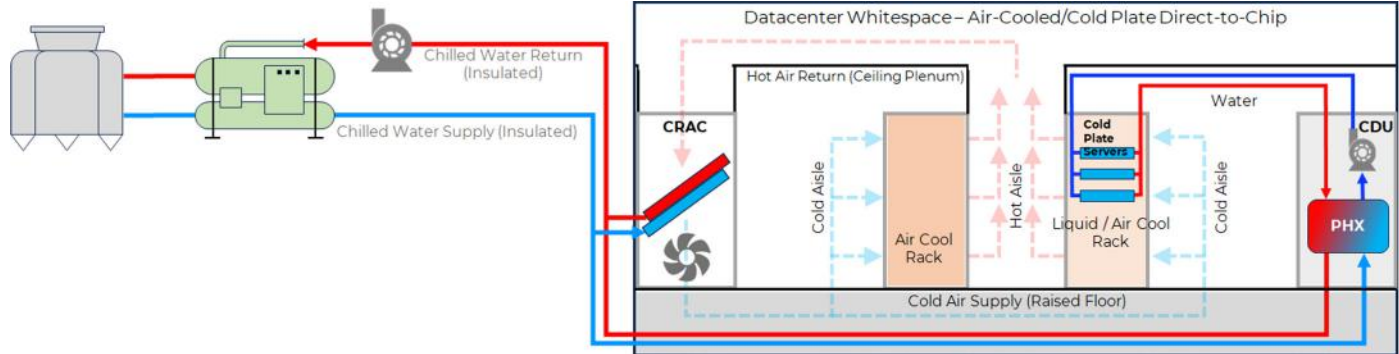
Mechanical Layout of Air-cool and Cold Plate liquid-cool system
